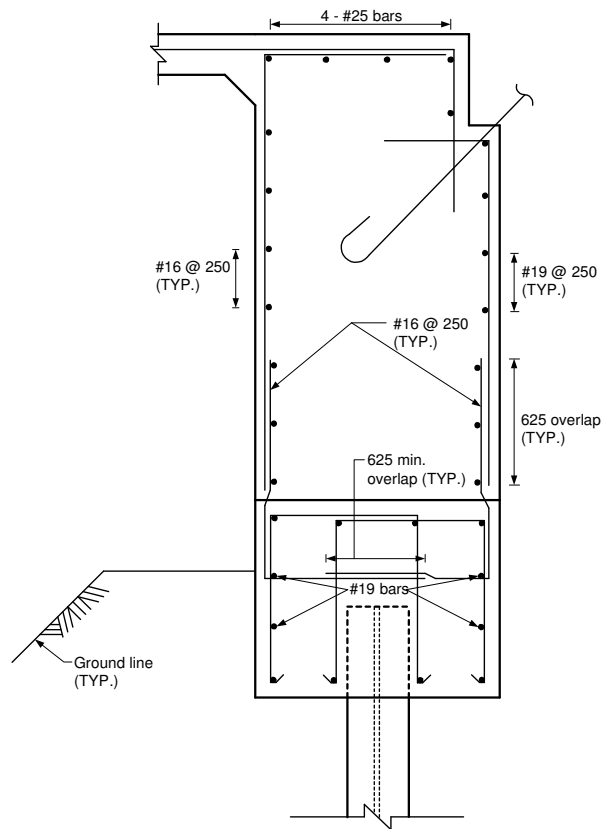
Integral Abutment Reinforcement, Pile Without Girder
